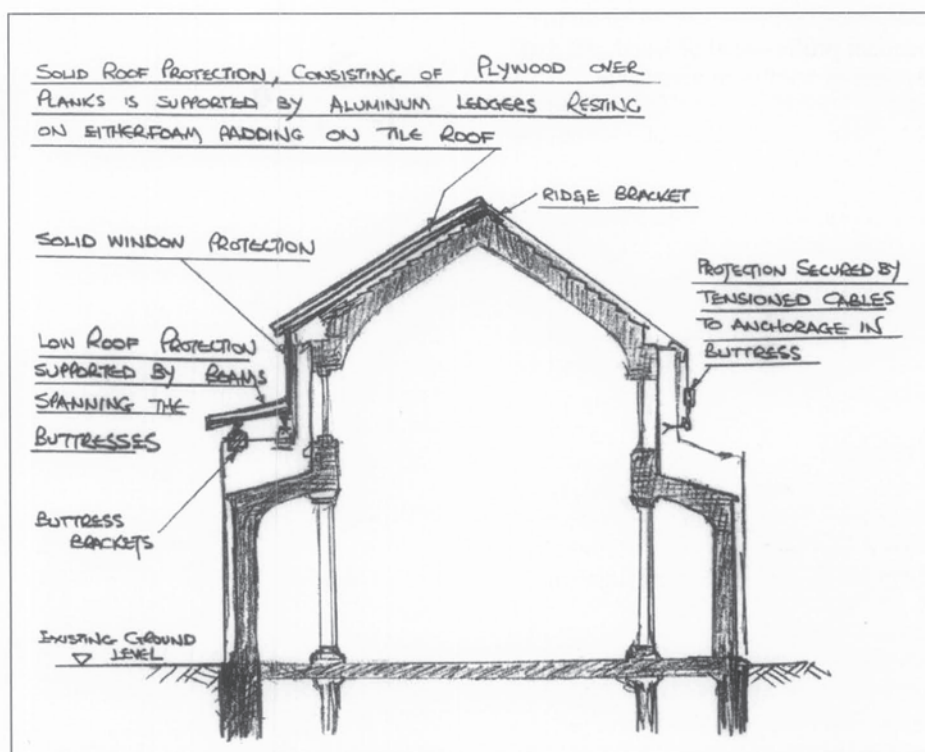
Before new construction was undertaken to the left of this church, a subcontractor was hired to design a protective system for the tile roof and clerestory windows. Drawing: Alan Shalders, Universal Builders Supply, Inc.
